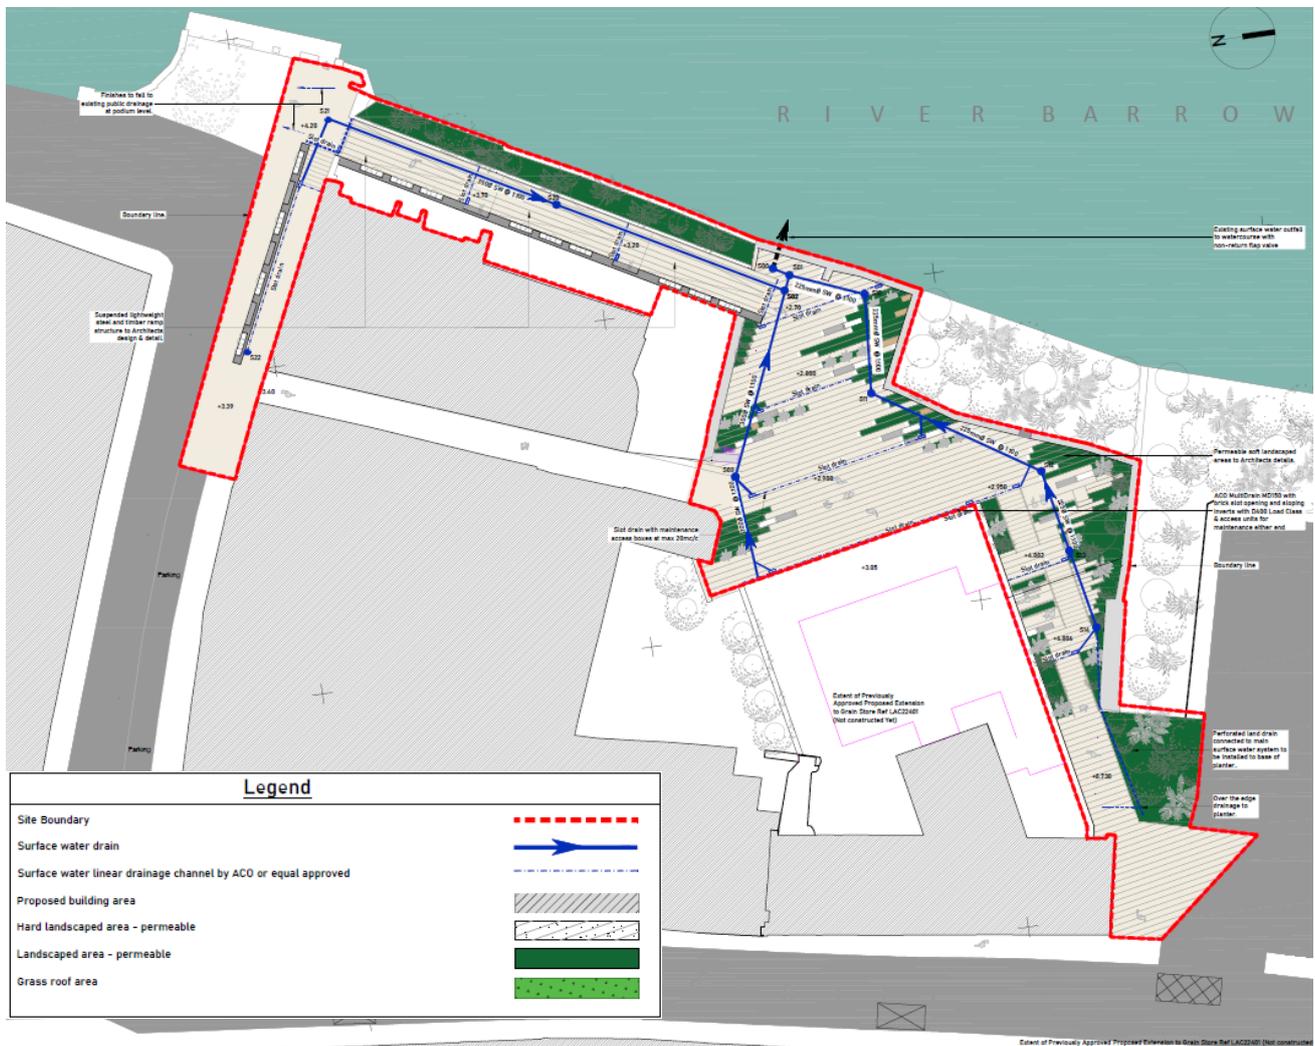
Proposed Site Drainage Layout (Source: Brunner Consulting Engineers)
